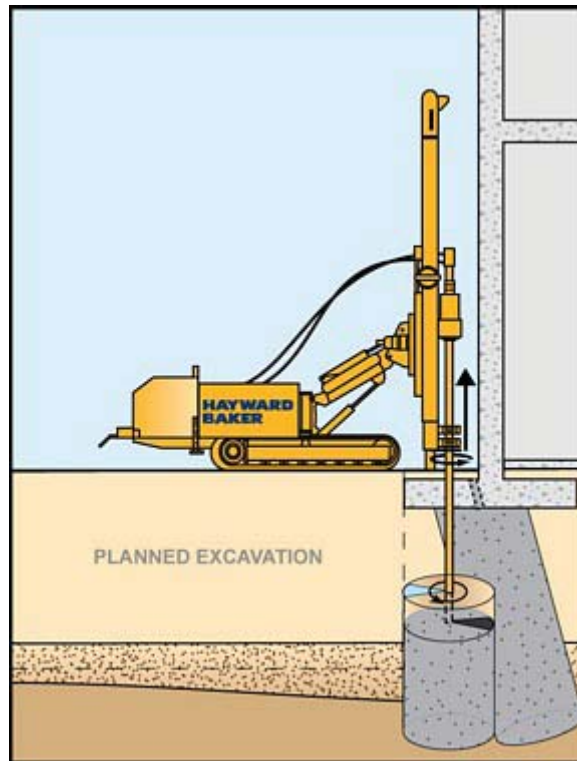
Installation of a soilcrete column using jet-grouting (Hayward Baker, 2014).
